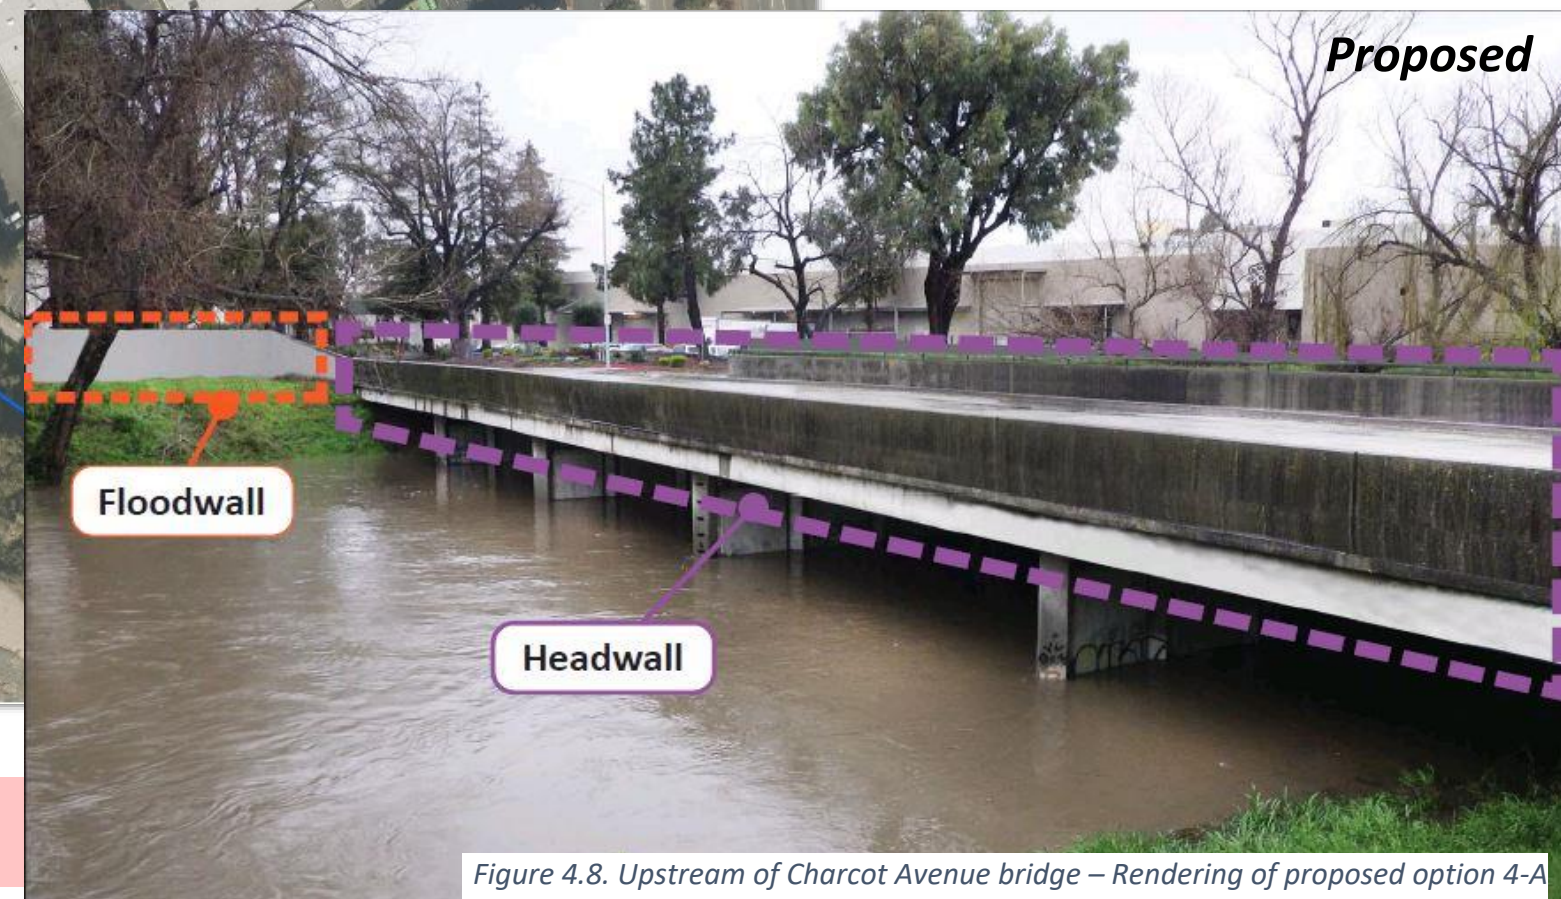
Upstream of Charcot Avenue bridge – Rendering of proposed option 4-A
